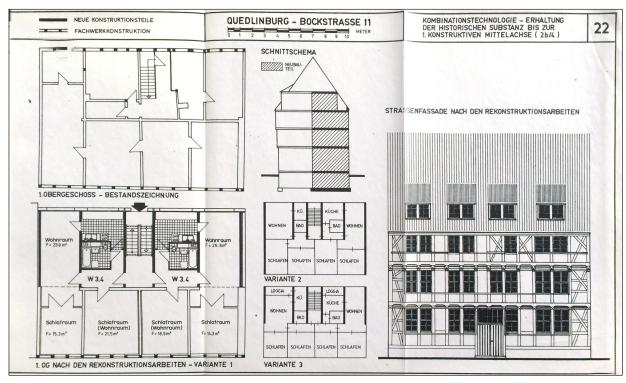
Design to replace a historic timber-frame structure with an in-situ concrete design behind the old front facade (Stelzer 1978: Figure 22).
